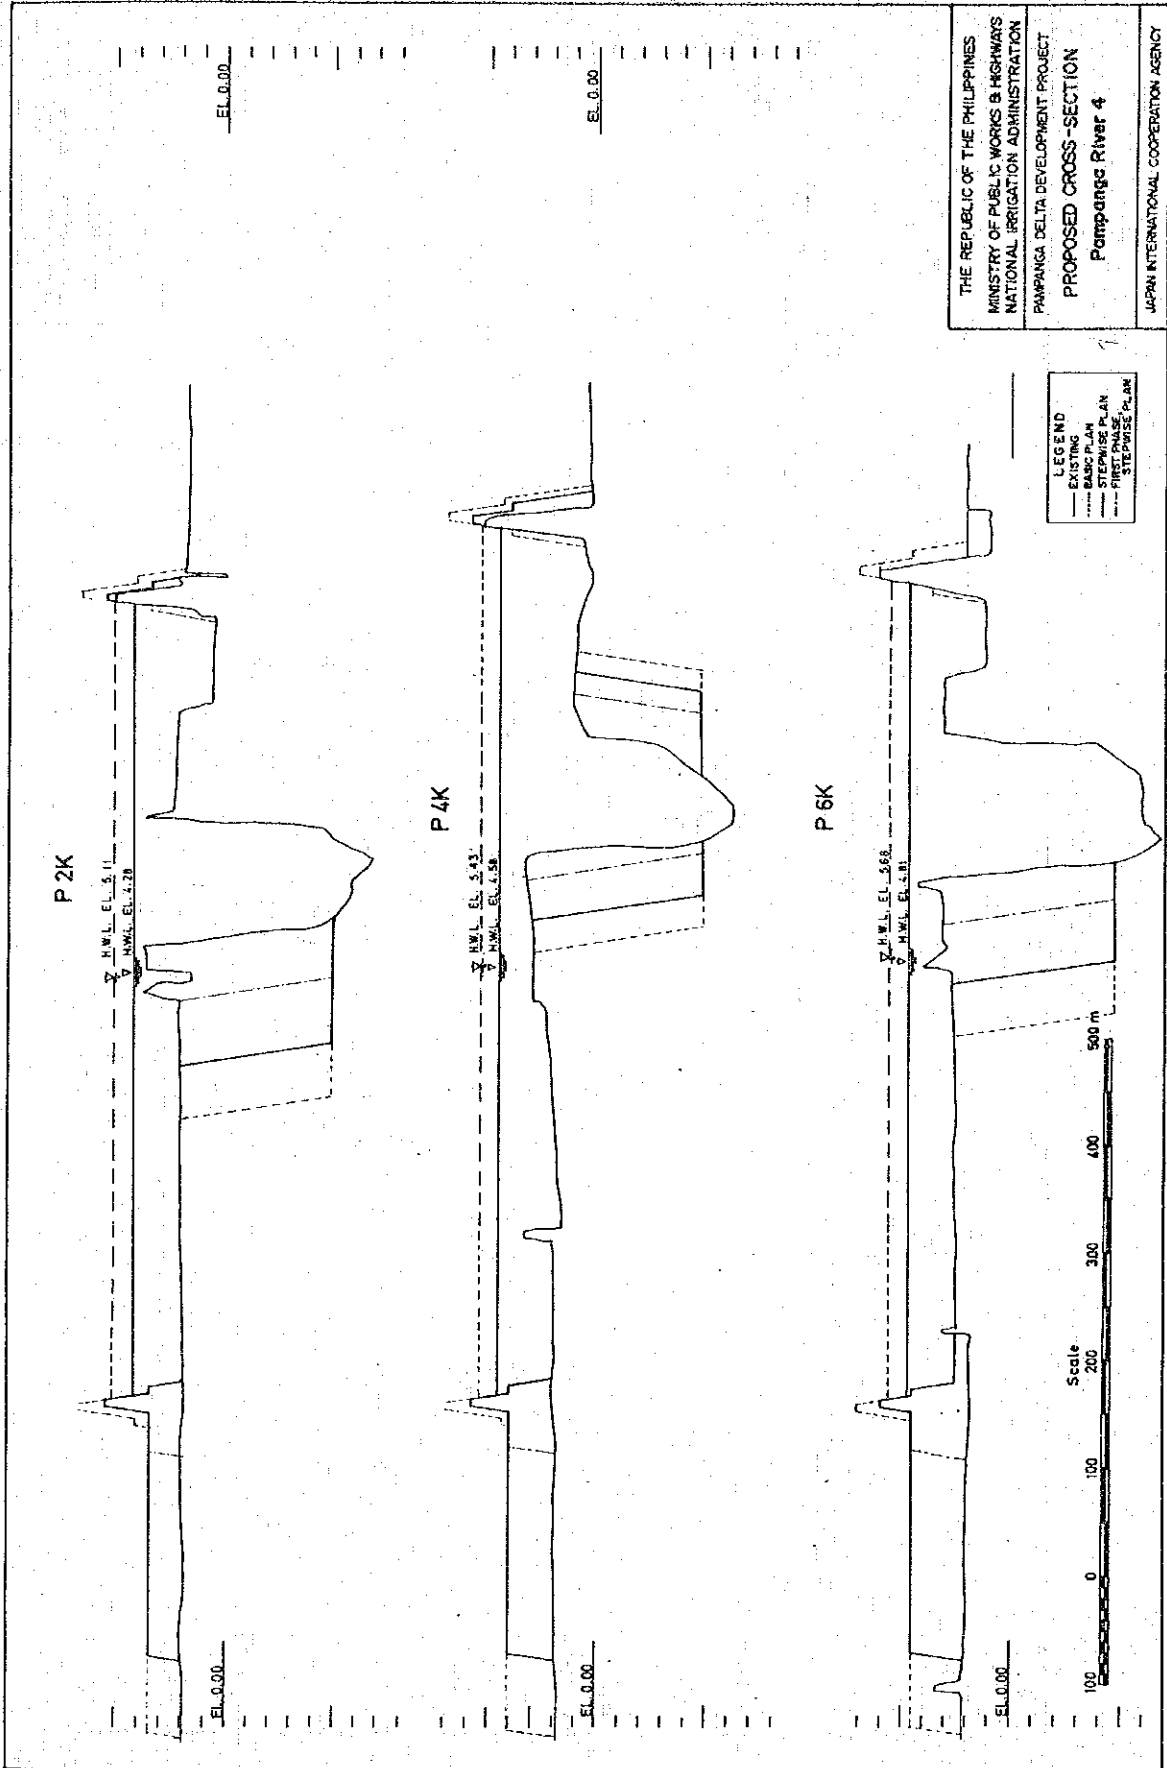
(5) PROPOSED CHANNEL CROSS-SECTION
